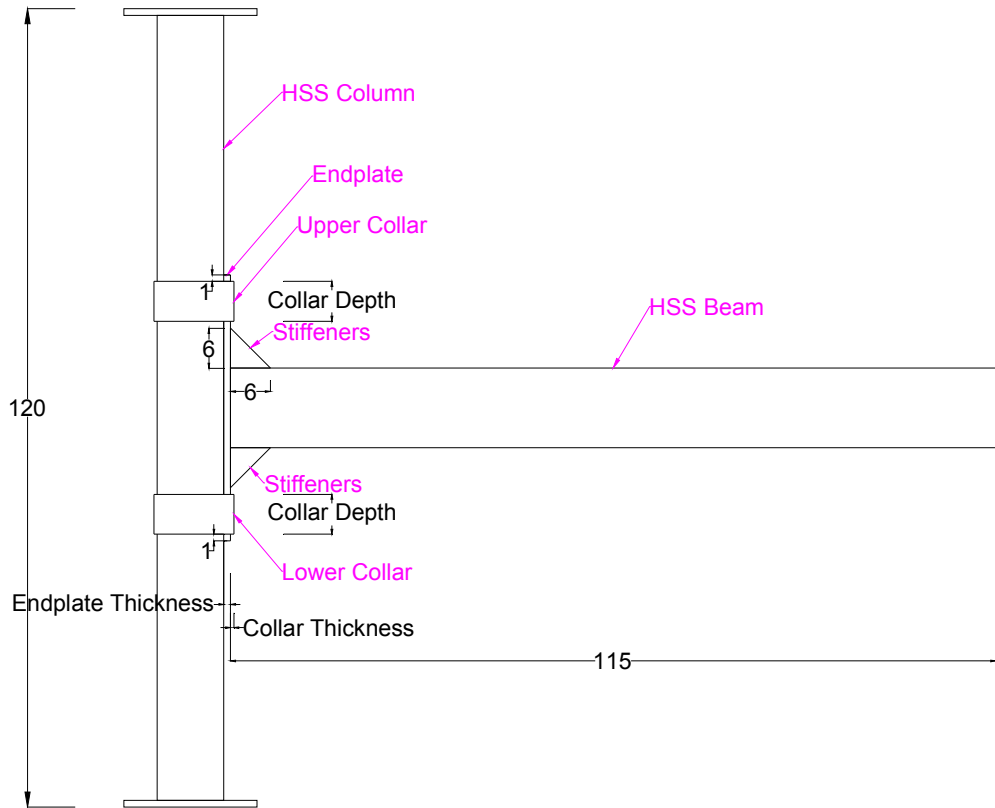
Elevation View of a Typical Collar Connection (units in inch)
